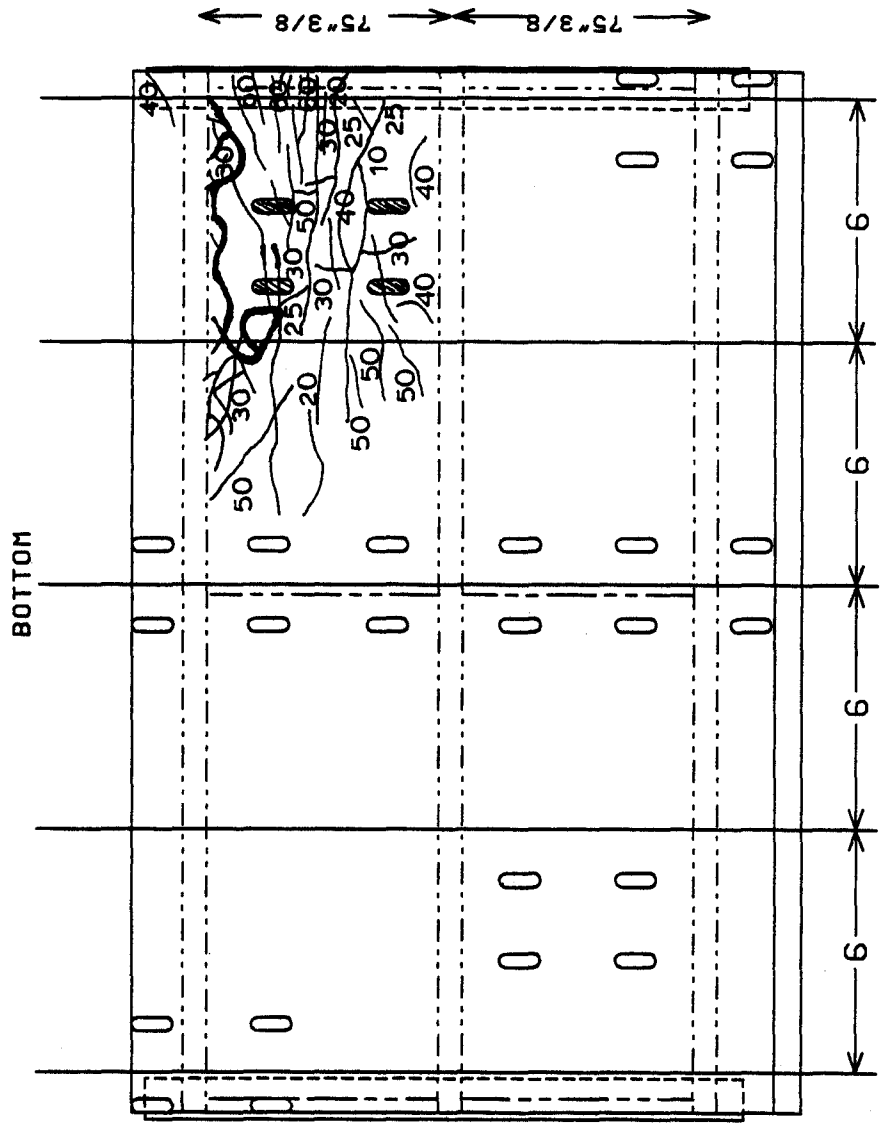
Bottom Cracking Pattern (Second Bridge - Test No. 8)
